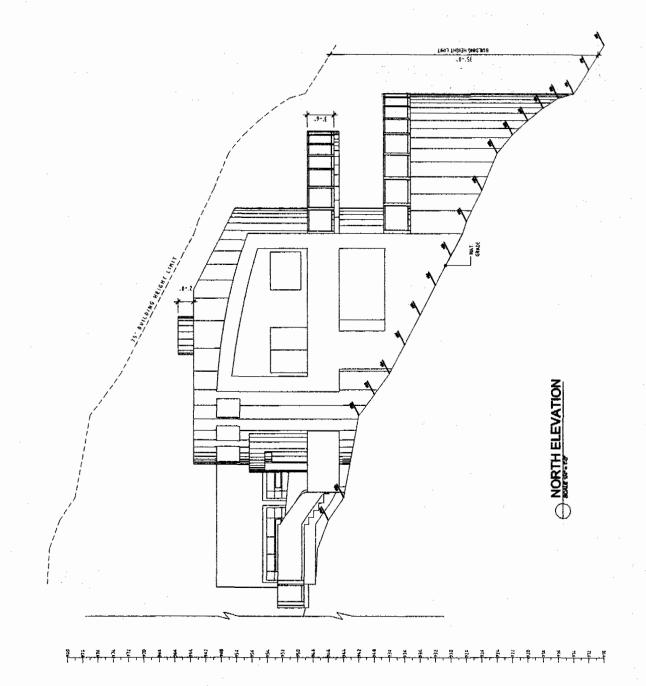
App. No. 4-06-018 Bonenfant North Elevation
